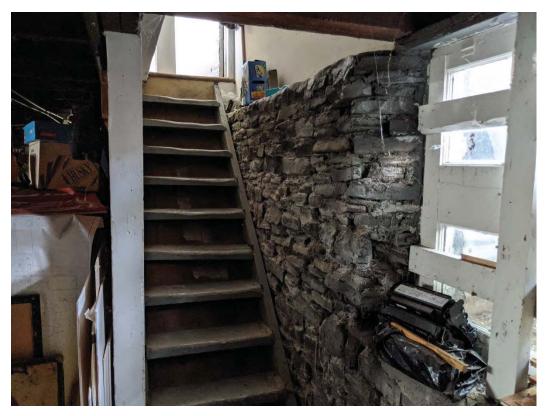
Stairwell leading to basement, stone foundation and window to the right (CY 2020).
